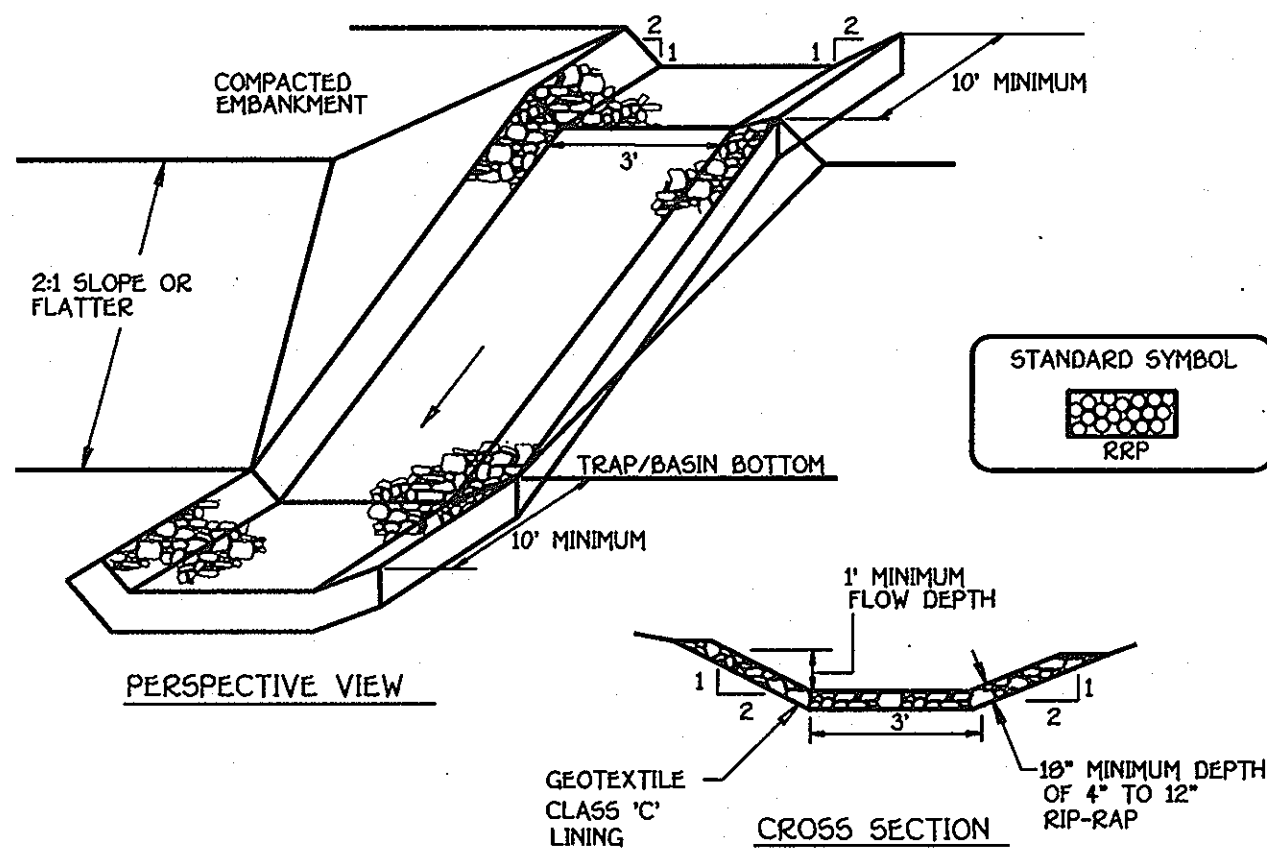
A - STONE / RIP-RAP OUTLET SEDIMENT TRAP - ST IV
